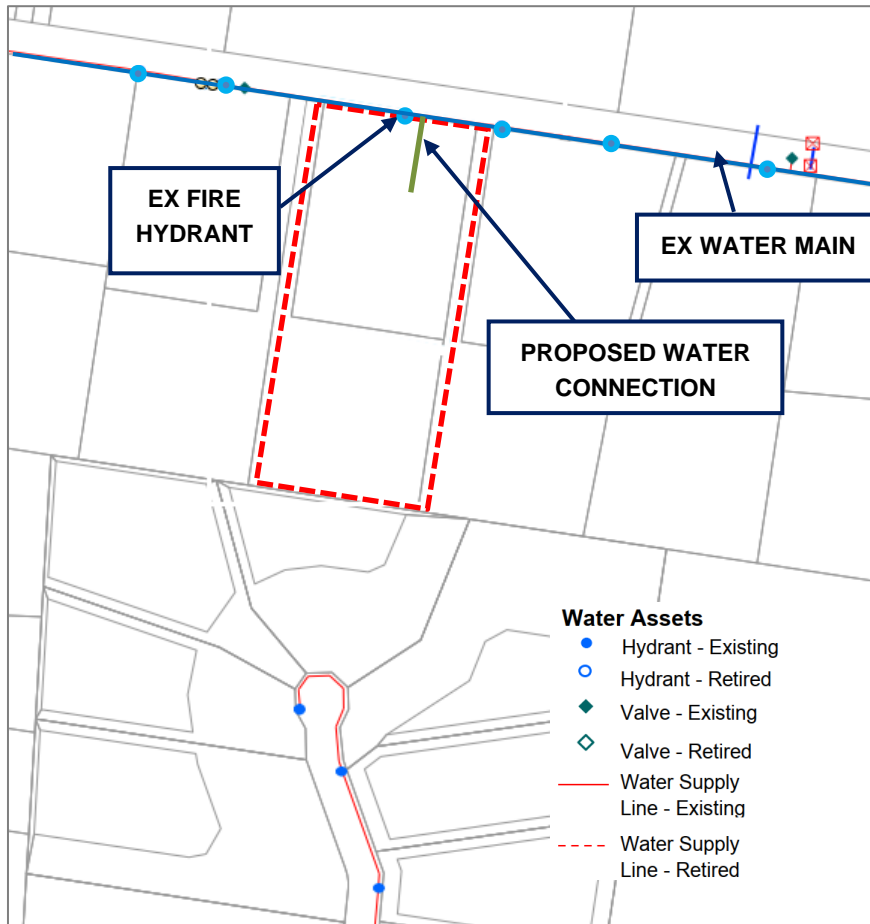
DBYD sewer and reticulated water infrastructure plan (Aug 2024)
